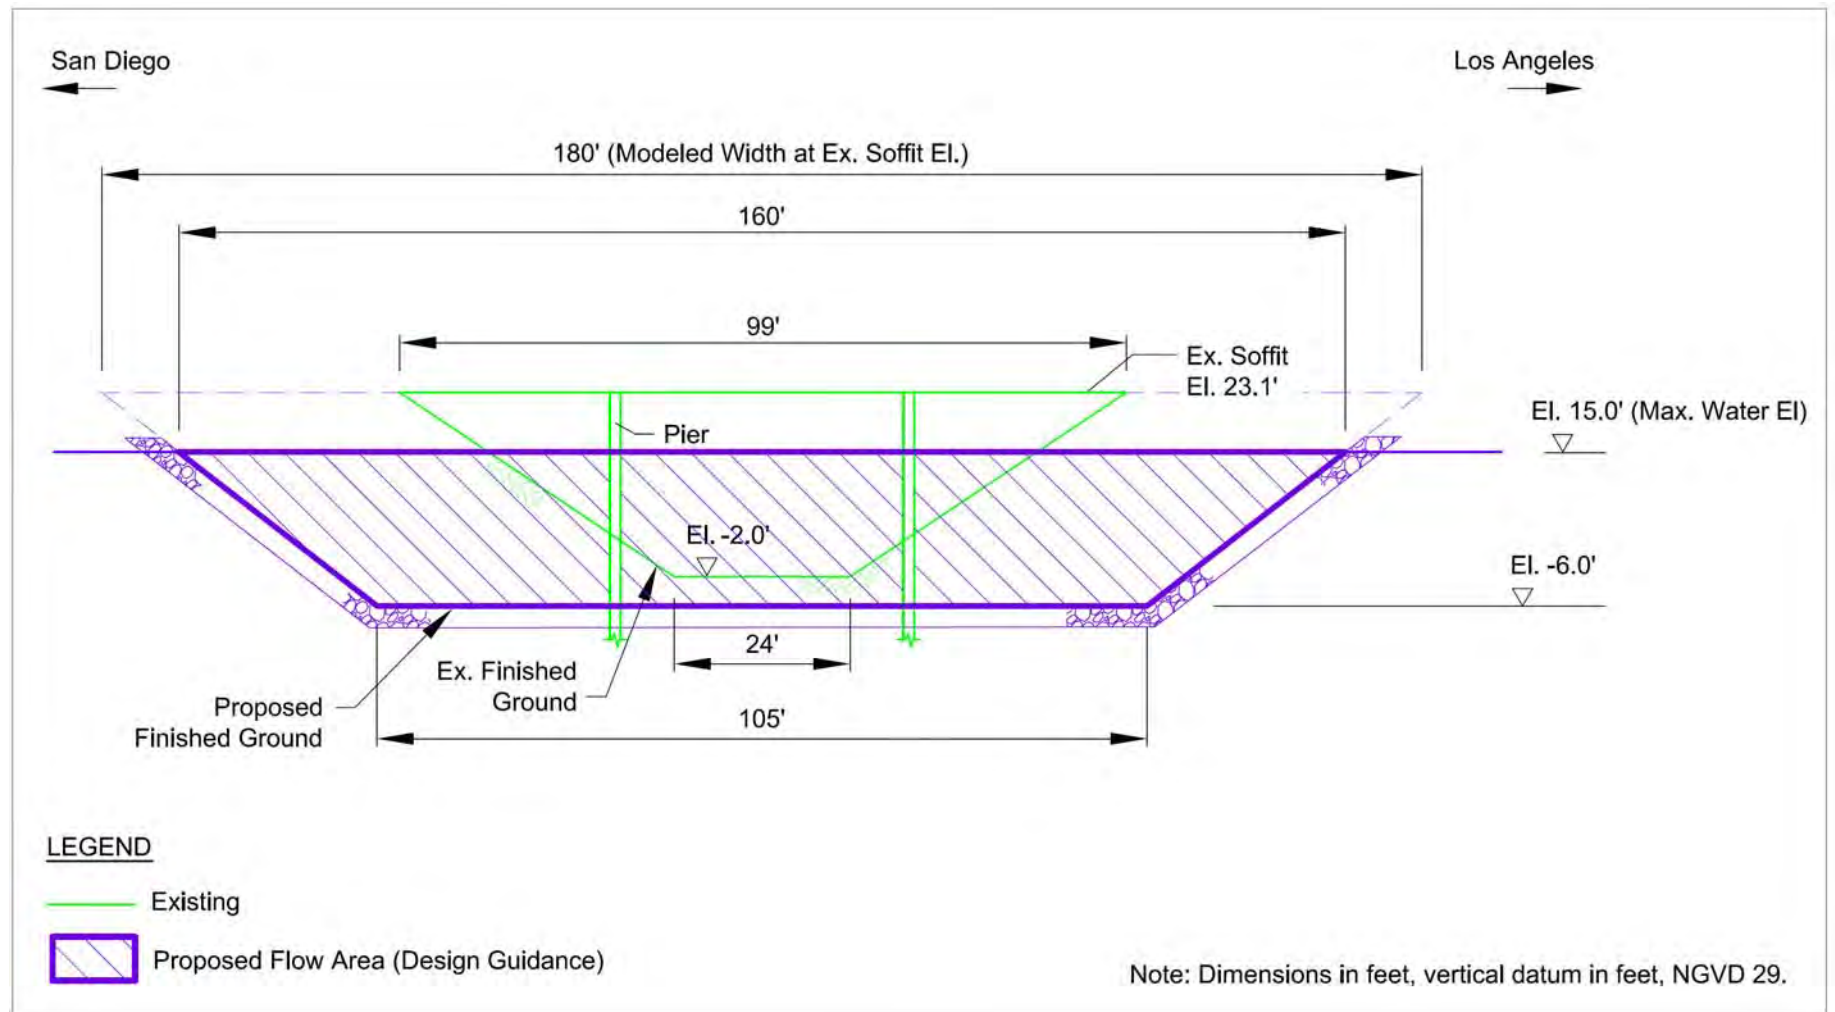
Design Guidance for Channel Cross Section of I-5 Bridge at Buena Vista Lagoon
